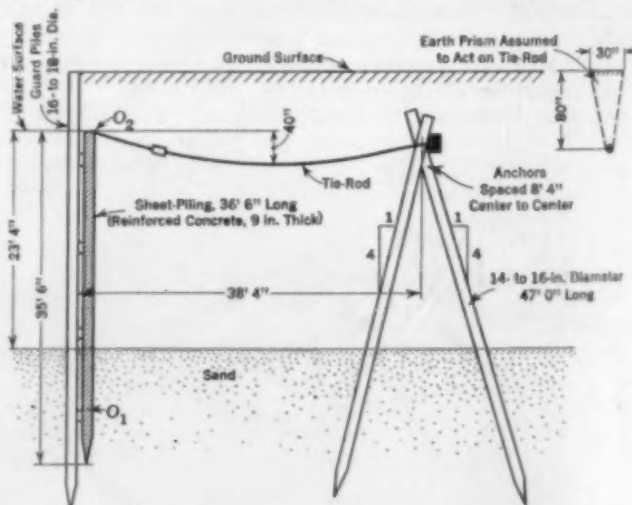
ANALYSIS OF A BULKHEAD FAILURE AT INDUSTRY HAVEN, STETTIN, GERMANY
